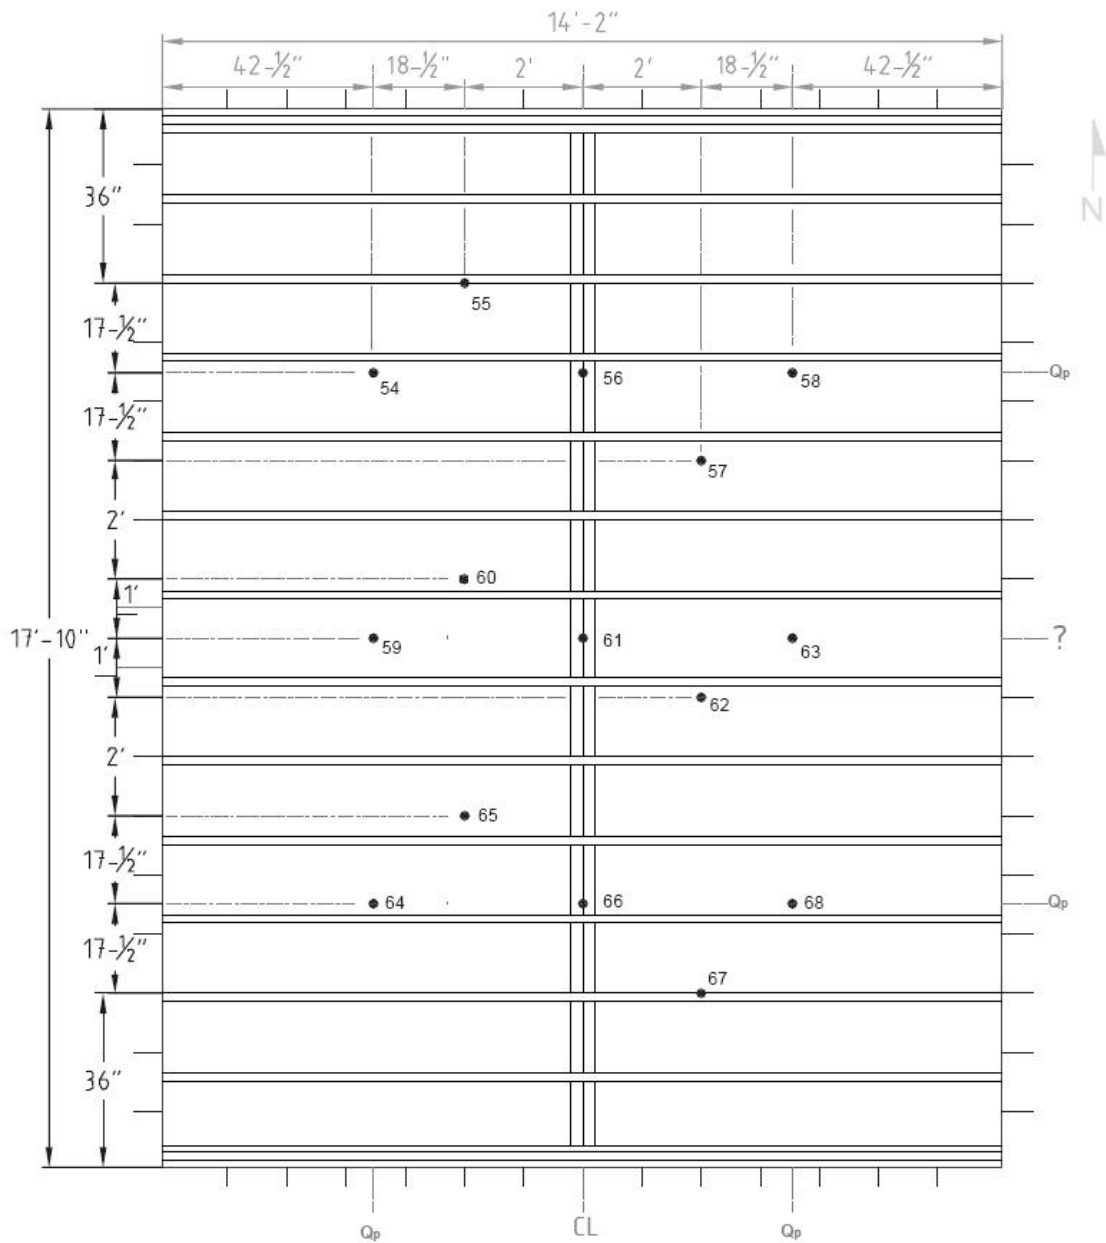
Thermocouple Locations on Unexposed Surface for assembly 1
